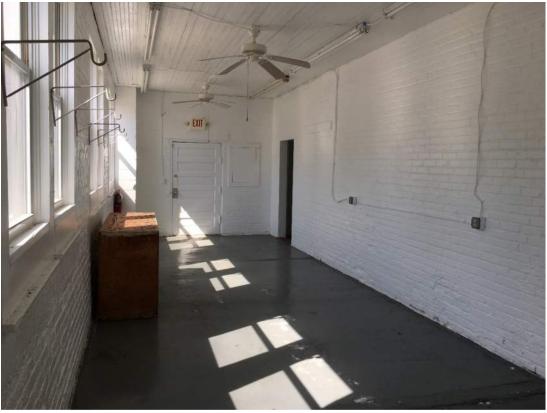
Hallway #2, Viewed from East Wall to West Wall
